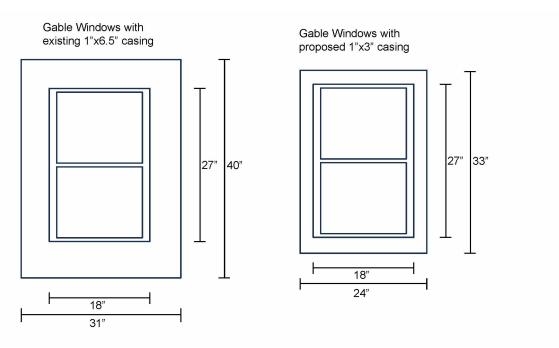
The applicant proposes to reduce the width of the casing around the new gable windows from 6.5 inches to 3 inches.
